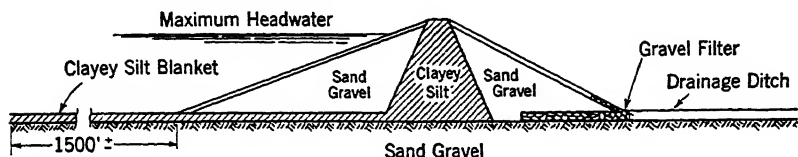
Suitable design for a site where both sand gravel and clayey silt are available and foundation is highly pervious to a great depth.
